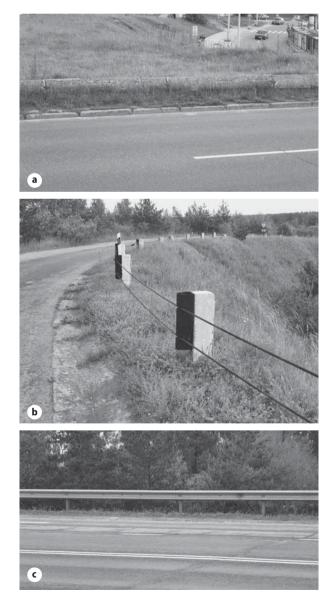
Guardrails installed on highways: a – reinforced concrete guardrail; b – cable guardrail; c – metal guardrail
